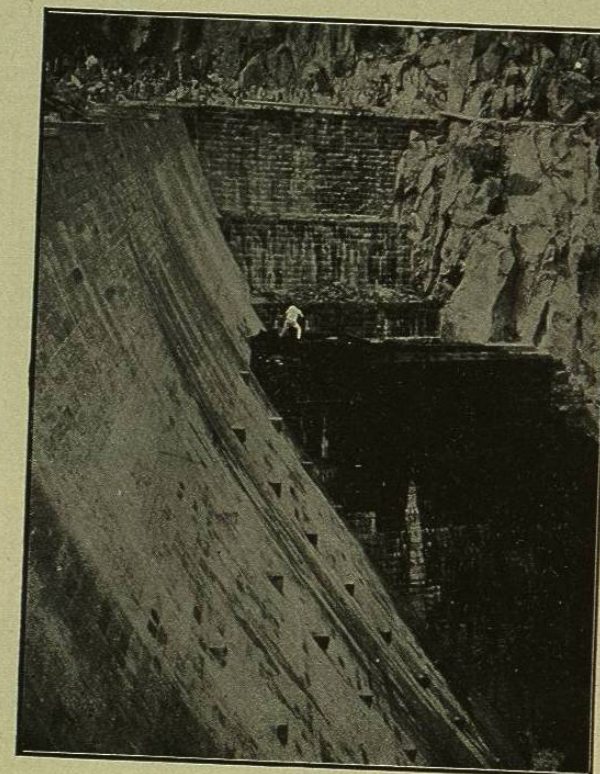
LOOKING ALONG THE FACE OF THE SAN JOSÉ DAM, AT SAN LUIS POTOSI, SHOWING FACE OF WALL SUPPORTING SIDE OF PRINCIPAL SPILLWAY.
